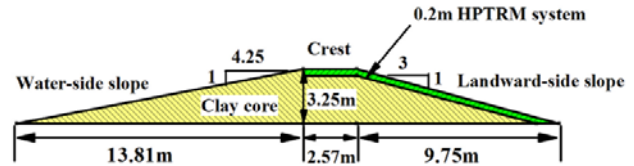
Cross-section profile of levee embankment strengthened by HPTRM in crest and landside slope
